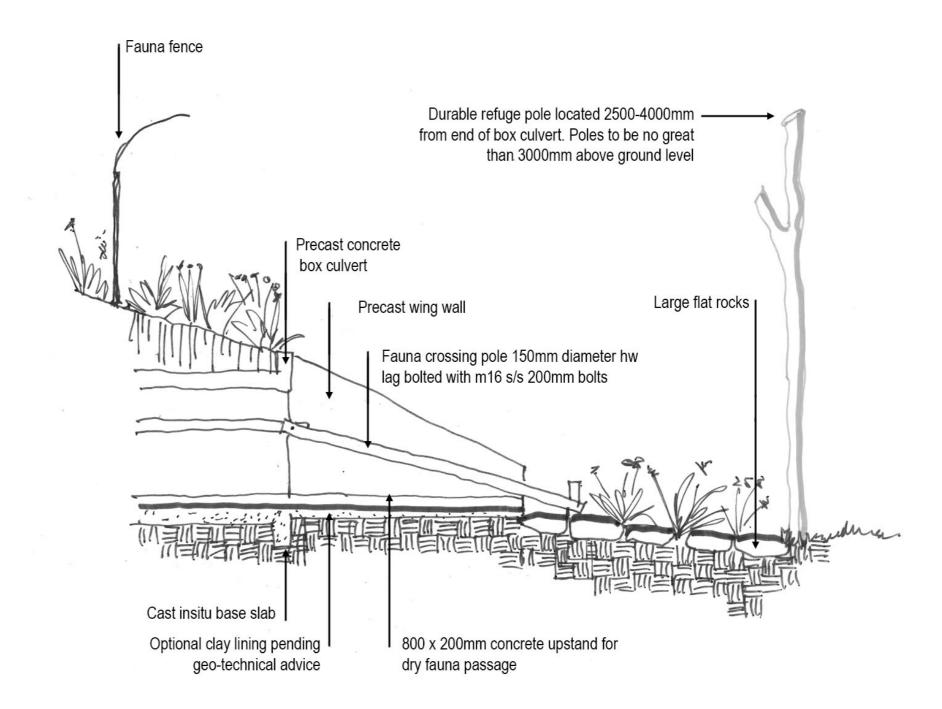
Typical landscape treatment for combined box culvert fauna passage - section.
